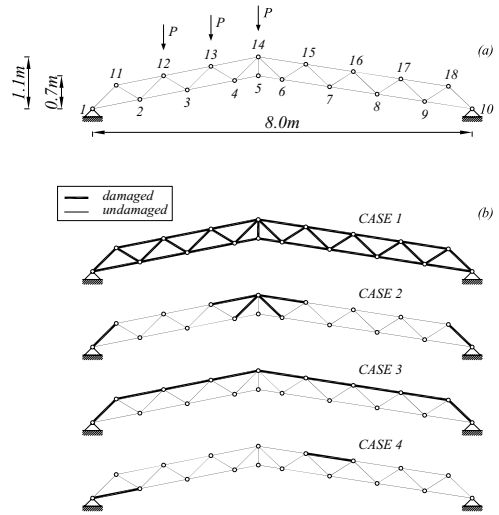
Truss System. (a) Geometry, static scheme, and loads. (b) Damage scenarios.
